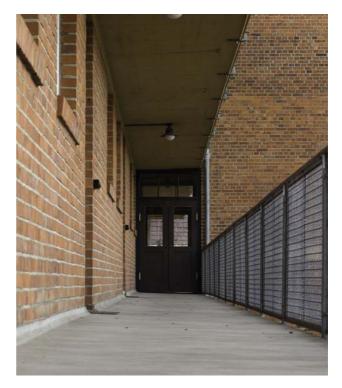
Balcony walkway with woven wire mesh parapet, photo 2008, Bauhaus Dessau Foundation, Doreen Ritzau
